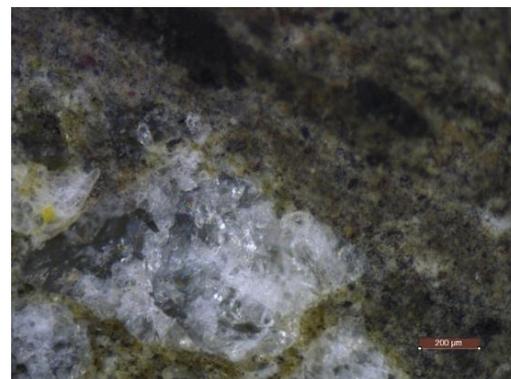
Connection detail of the PM-P reprofiling substance (in the lower left part) to the concrete substrate (100x).
